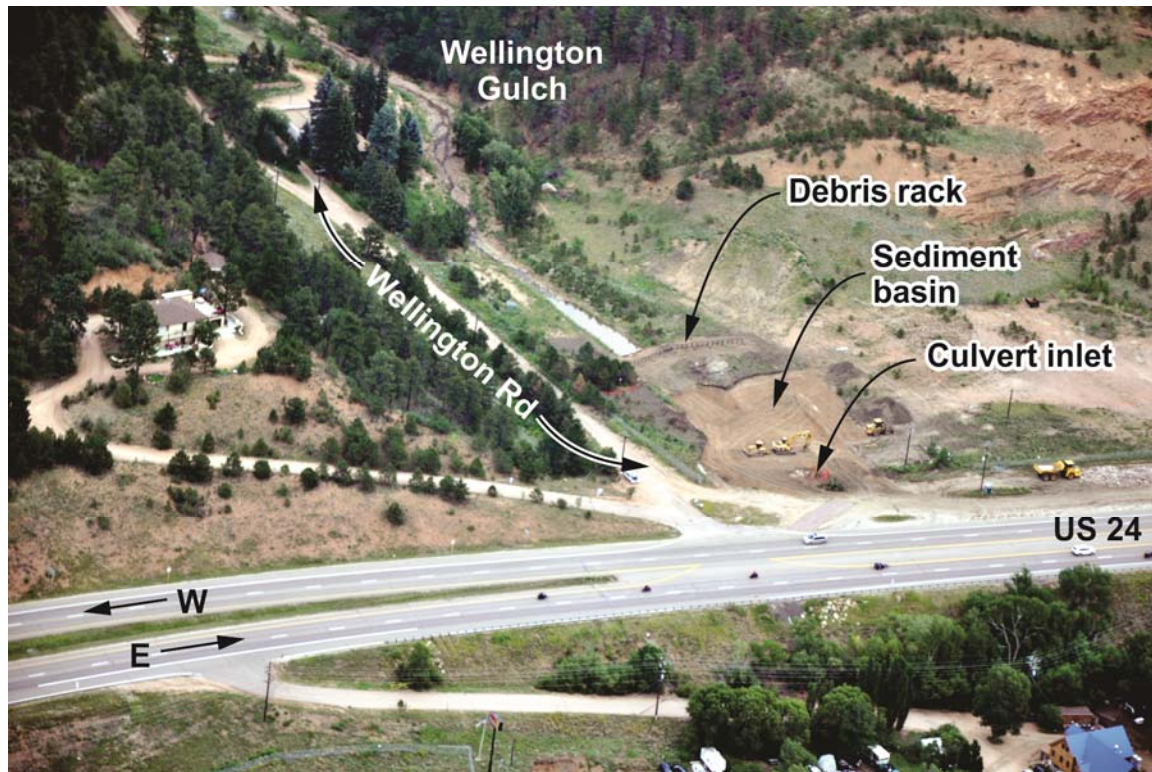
Oblique aerial view of the mouth of Wellington Gulch showing position of a sediment basin and a debris rack. View to the east; location of intersection of Wellington Road and westbound US 24: 38.9185° N, -104.9843° W, approximate elevation 7590 ft.
